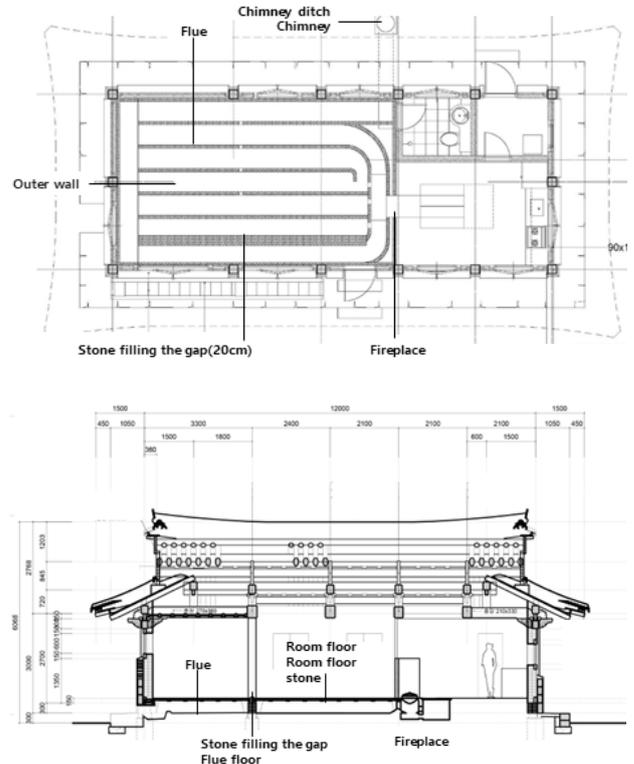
Housing 3 drawing - gudeul plan, Cross-section
